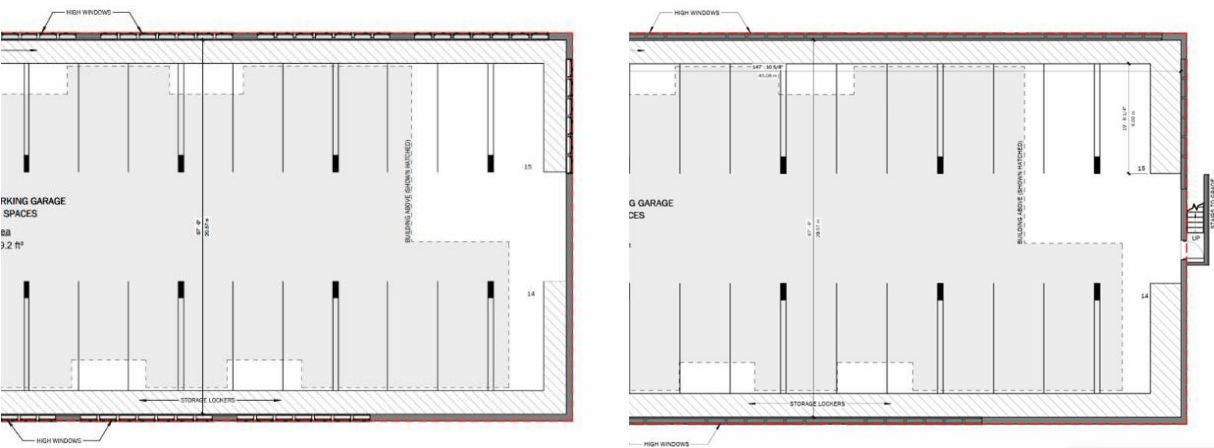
A new pedestrian exit from the parking structure to grade has been provided in the rear yard (right picture) whereas the previous design (left picture) does not have any exit at this location.
